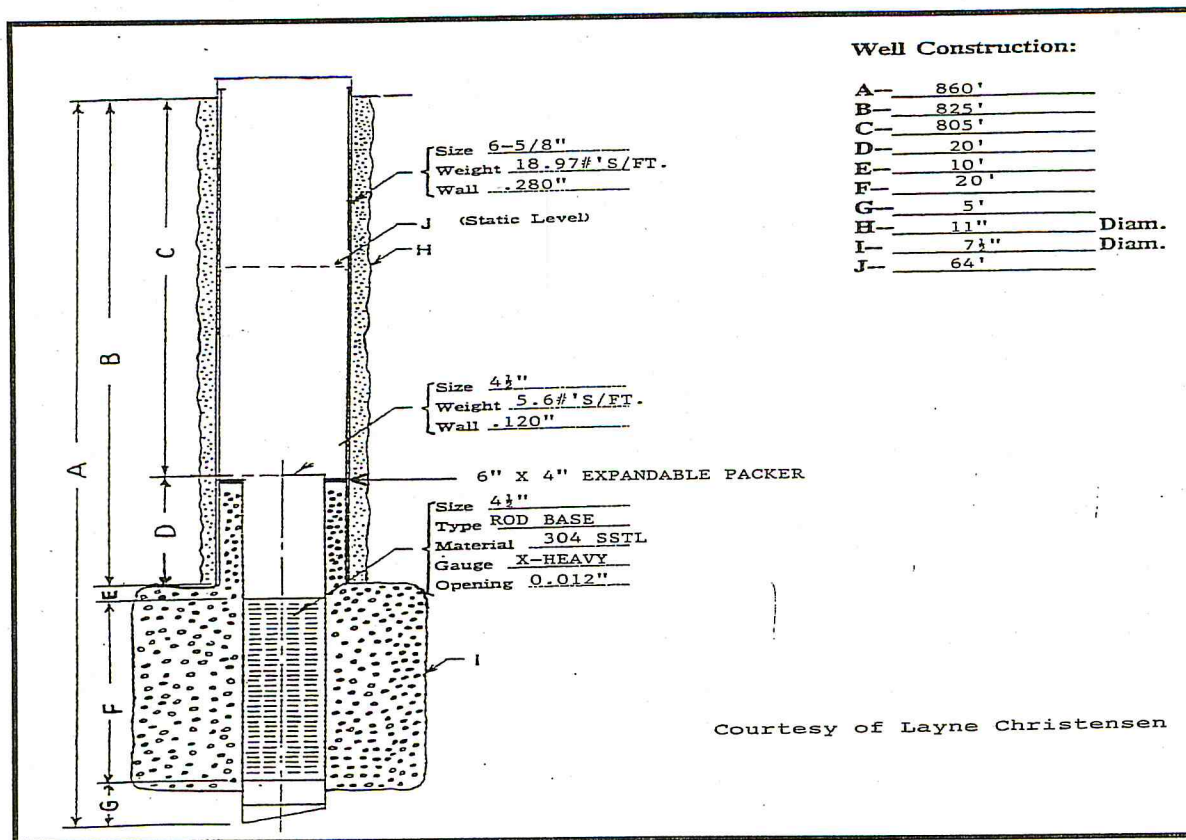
Construction diagram of the "800-foot" observation well, EB-1274.
